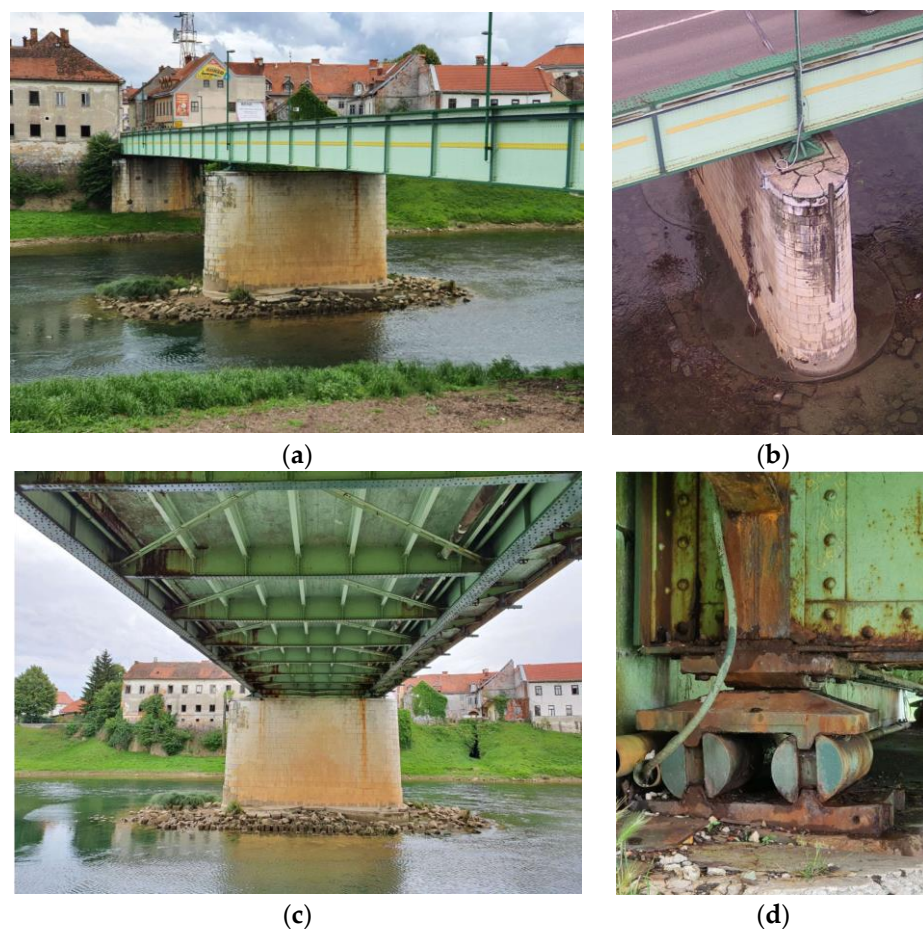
Overview of the case-study bridge: (a) side view, (b) detailed view of the middle pier and well foundations, (c) view below the bridge deck, and (d) detailed view of the roller bearing at the abutment.
